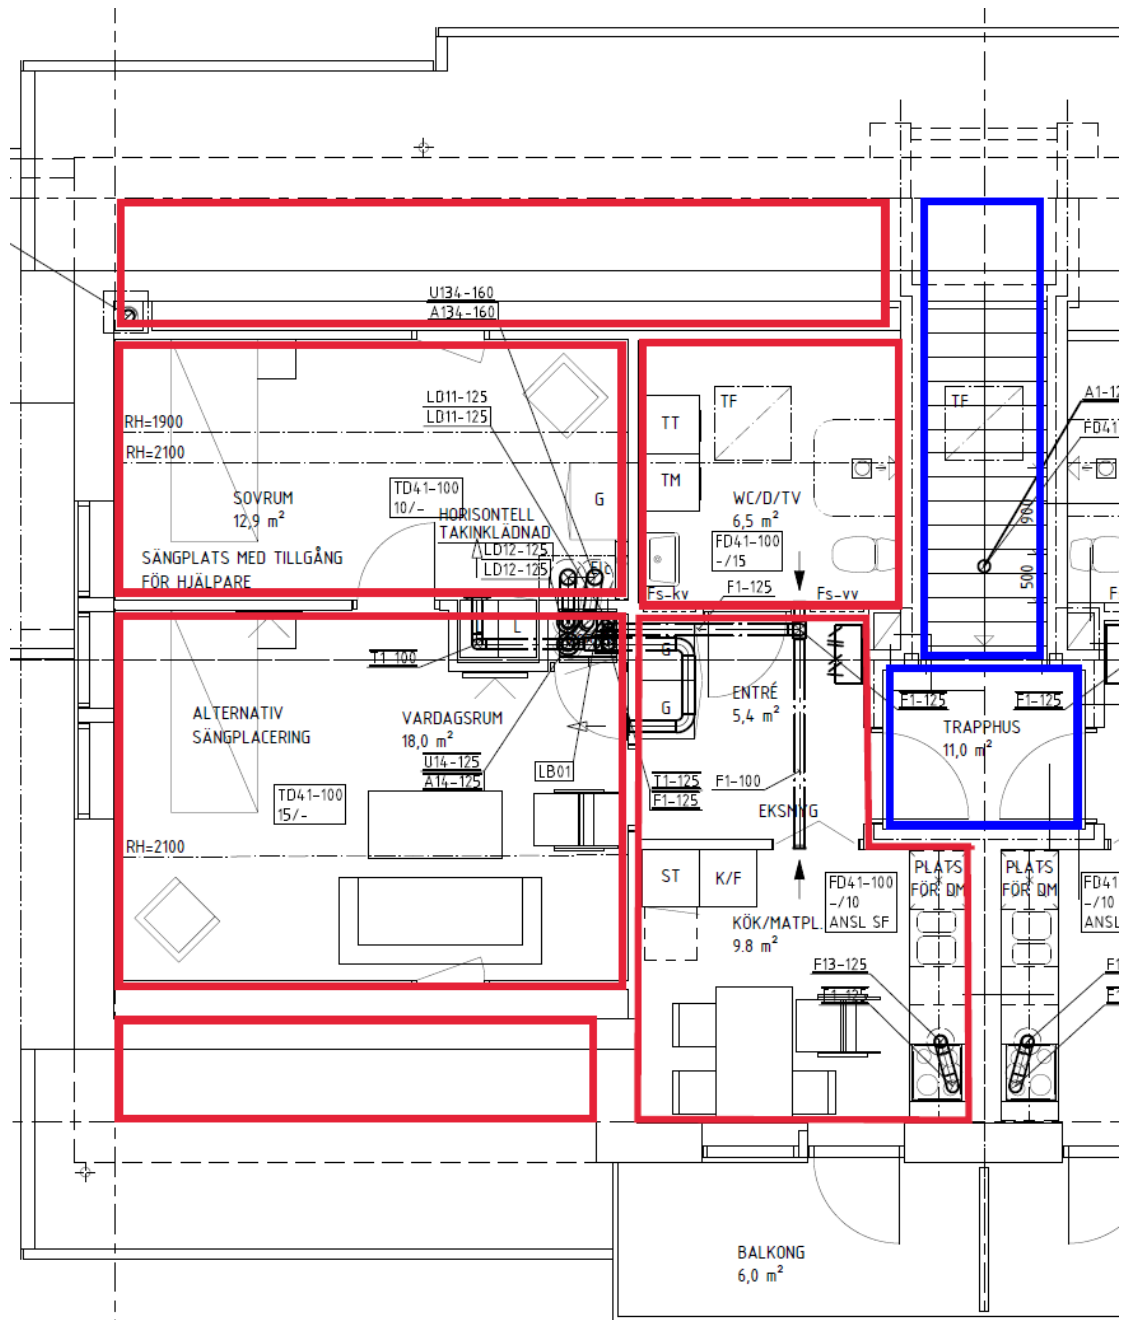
Second floor apartment thermal zones (red) and the staircase and apartment entrance (blue).
